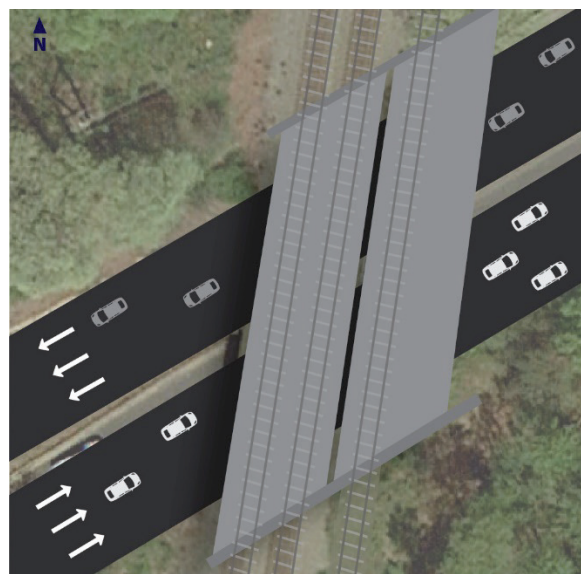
Proposed Typical Route 1 and Newington Road Improvements
